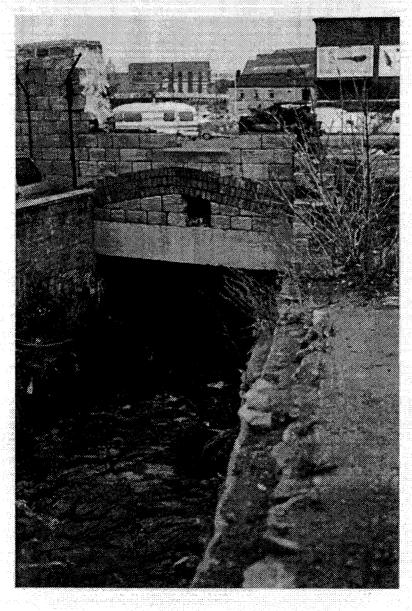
CULVERT No.21 (Inlet above - Outlet below)
